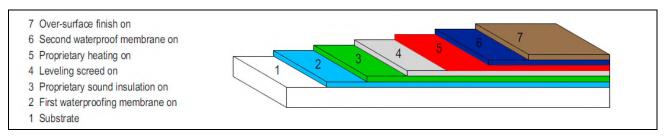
Heating and sound insulation layers, if installed on an existing slab
